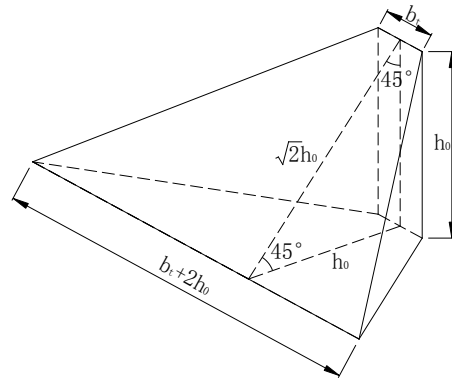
Punching Shear Failure Cone at 1/4 of the Foundation
